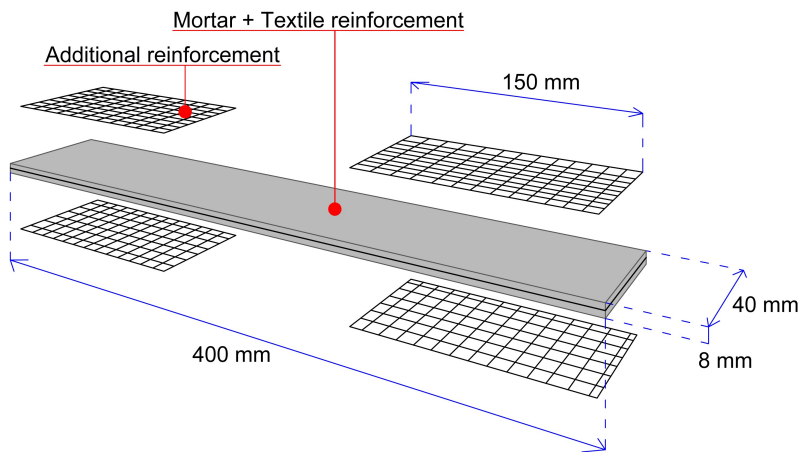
Additional reinforcement in composite specimen strengthened with one basalt grid layer
